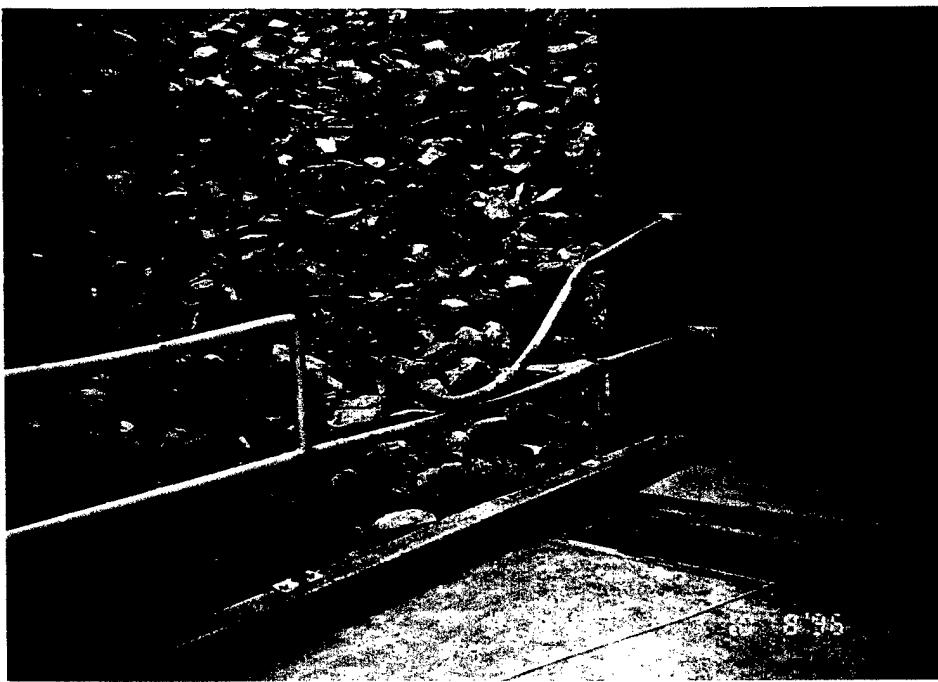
Damaged railing section at the south east corner of the upstream control platform.
